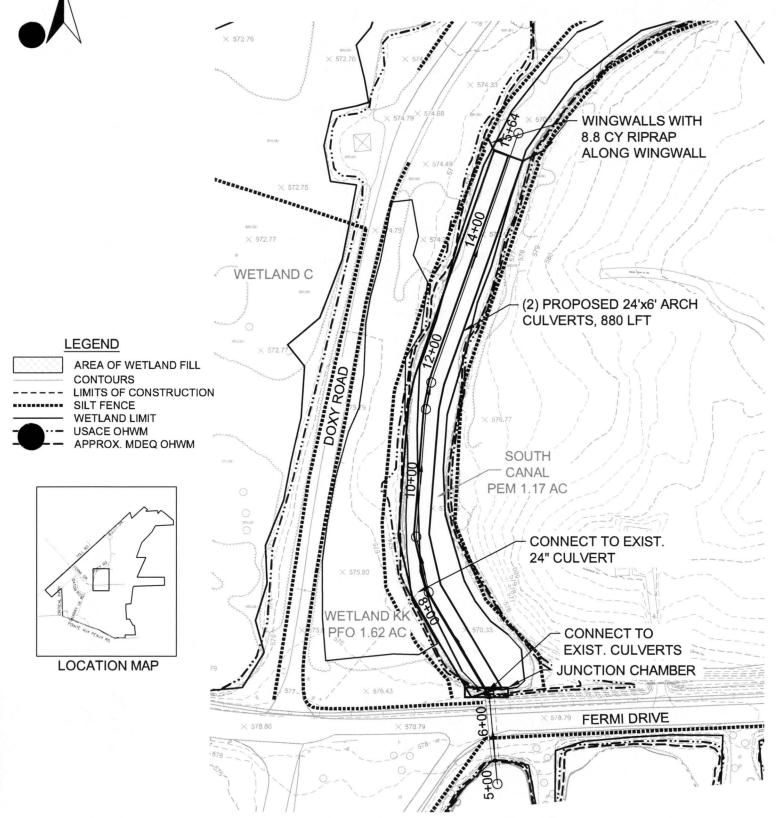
A CONSTRUCTION AREA 5 PLAN VIEW
